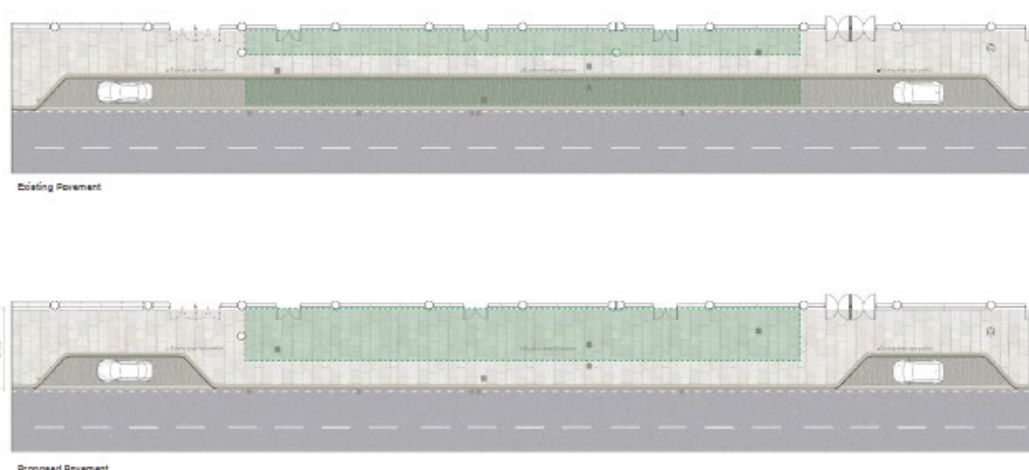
Plan of proposed change to loading bay and drop off capacity.
